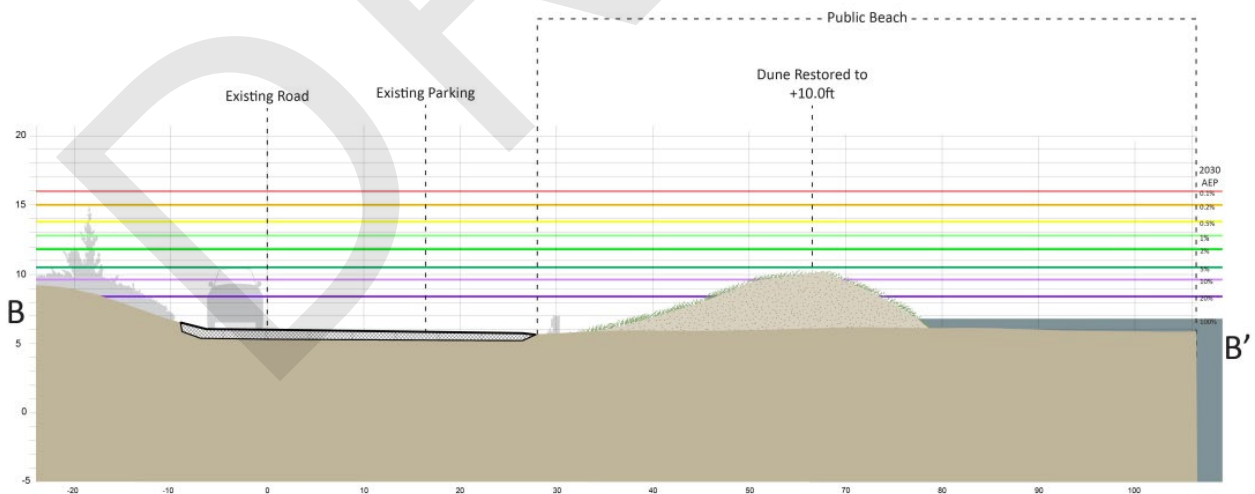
Circuit Avenue Alternative 3 – Green, Cross-Section
